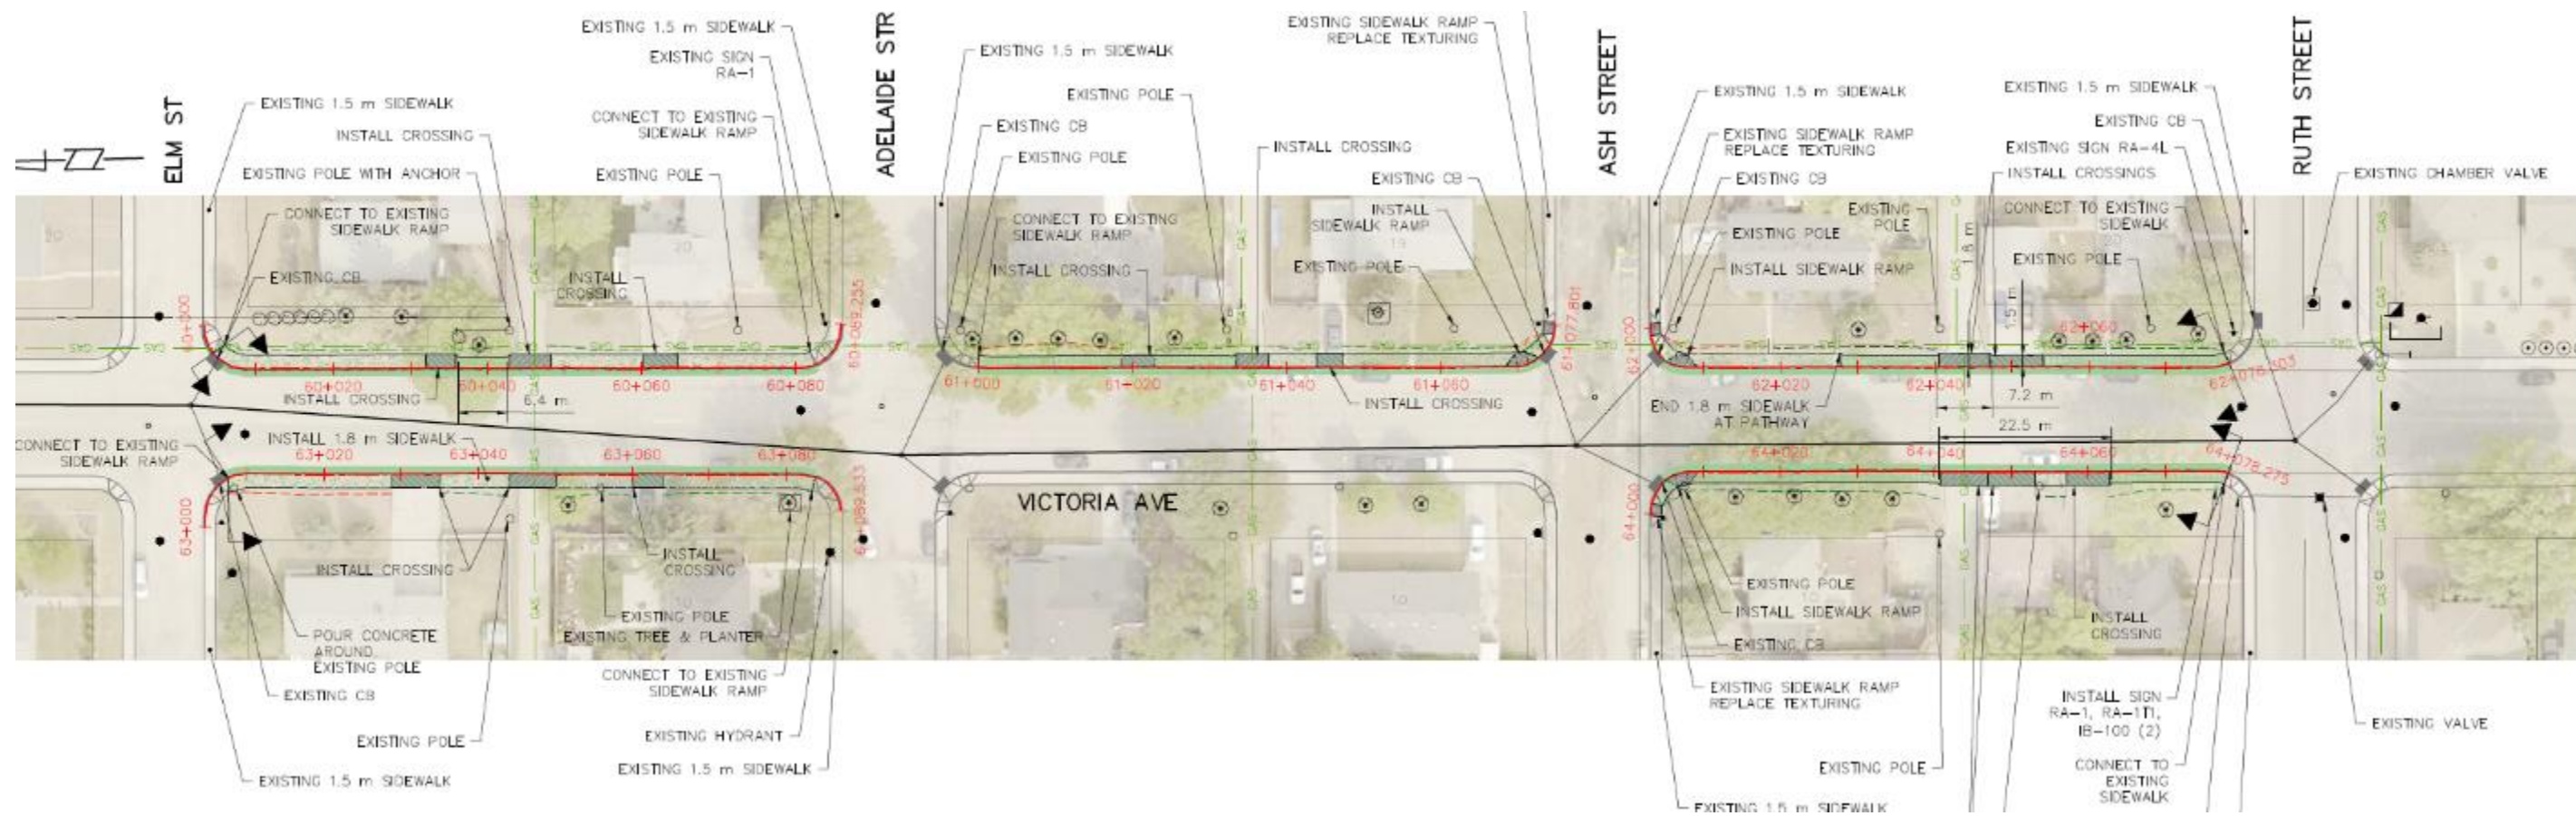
Sidewalk Installation Plan for Victoria Avenue
